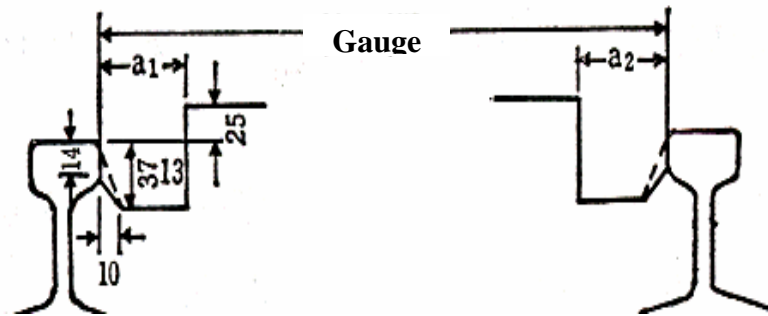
Lower part gauge of construction gauge (for general cases)
